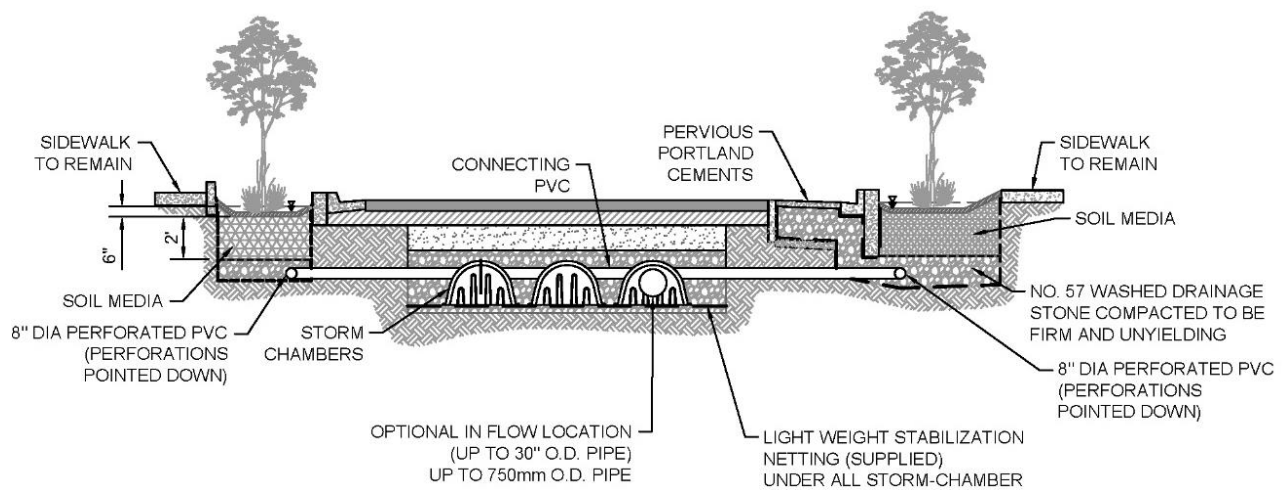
Typical green street cross section (Source: Tetra Tech, 2017).
